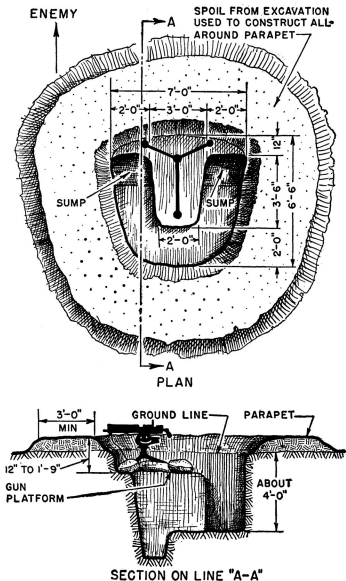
Caliber .30 machine-gun (heavy) emplacement, open standing type.
